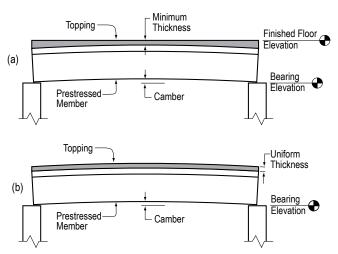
Possible topping conditions resulting from camber of a prestressed floor member: (a) topping held to constant finished floor elevation; and (b) topping held to uniform thickness.
